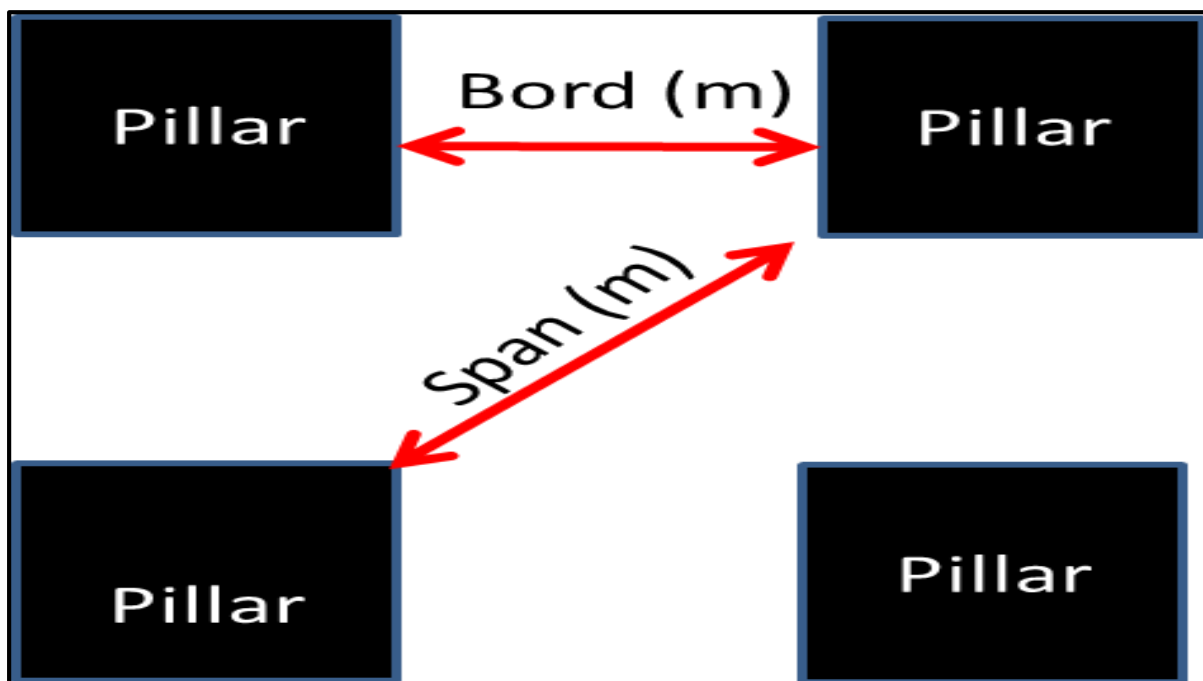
Plan view indicating the intersection span in a bord and pillar environment.
